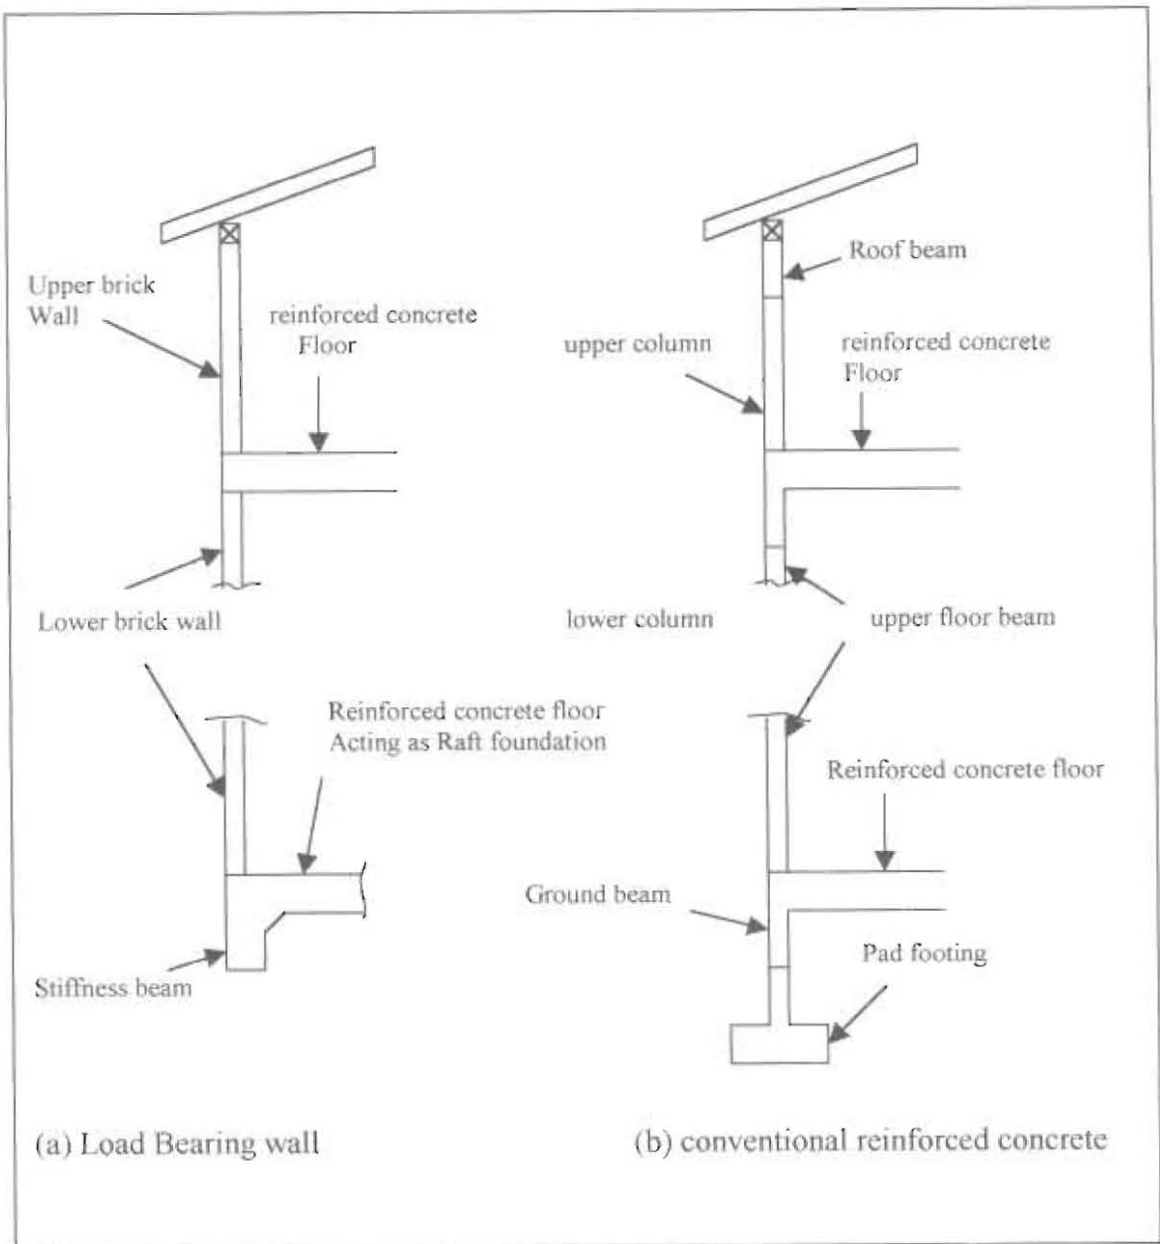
Typical load bearing wall and reinforced concrete building elements by side view.
